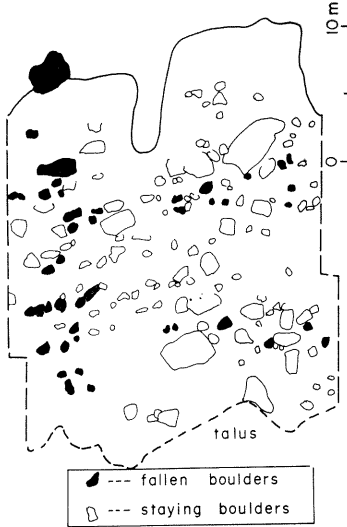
Rock fall from sidewall No. 8 (flat slope) as found in Photo. 5.
